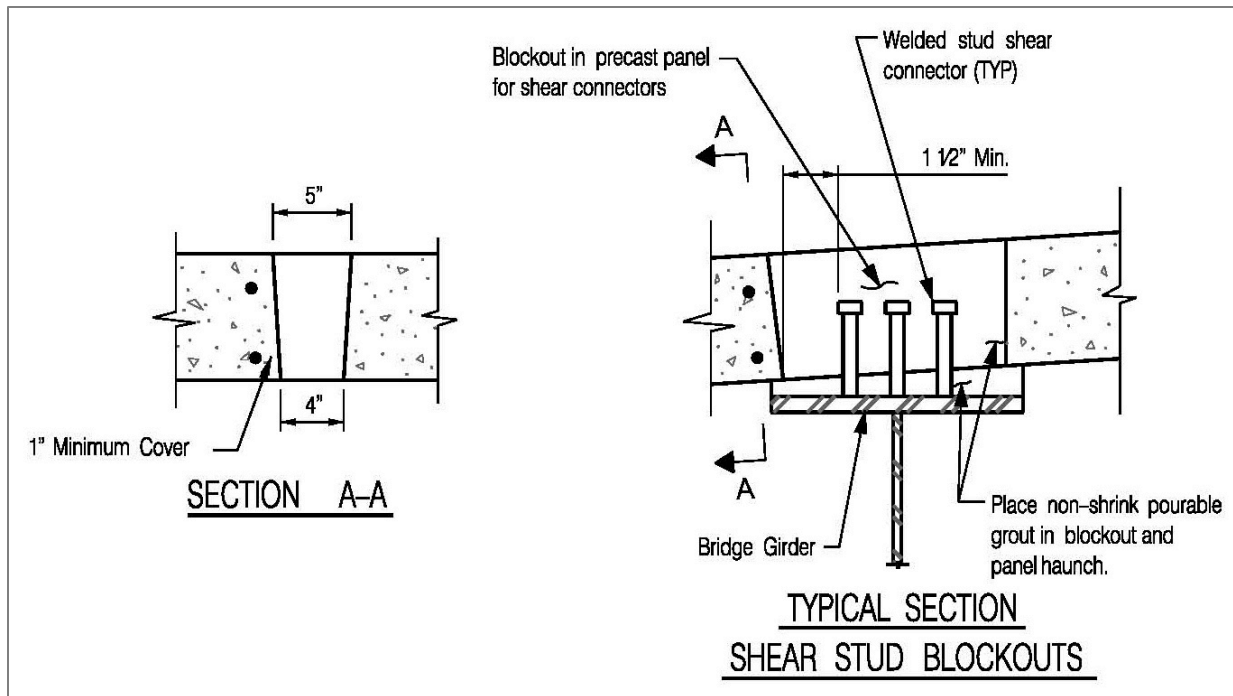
Connection of Precast Deck Panel to Existing Concrete Beams
